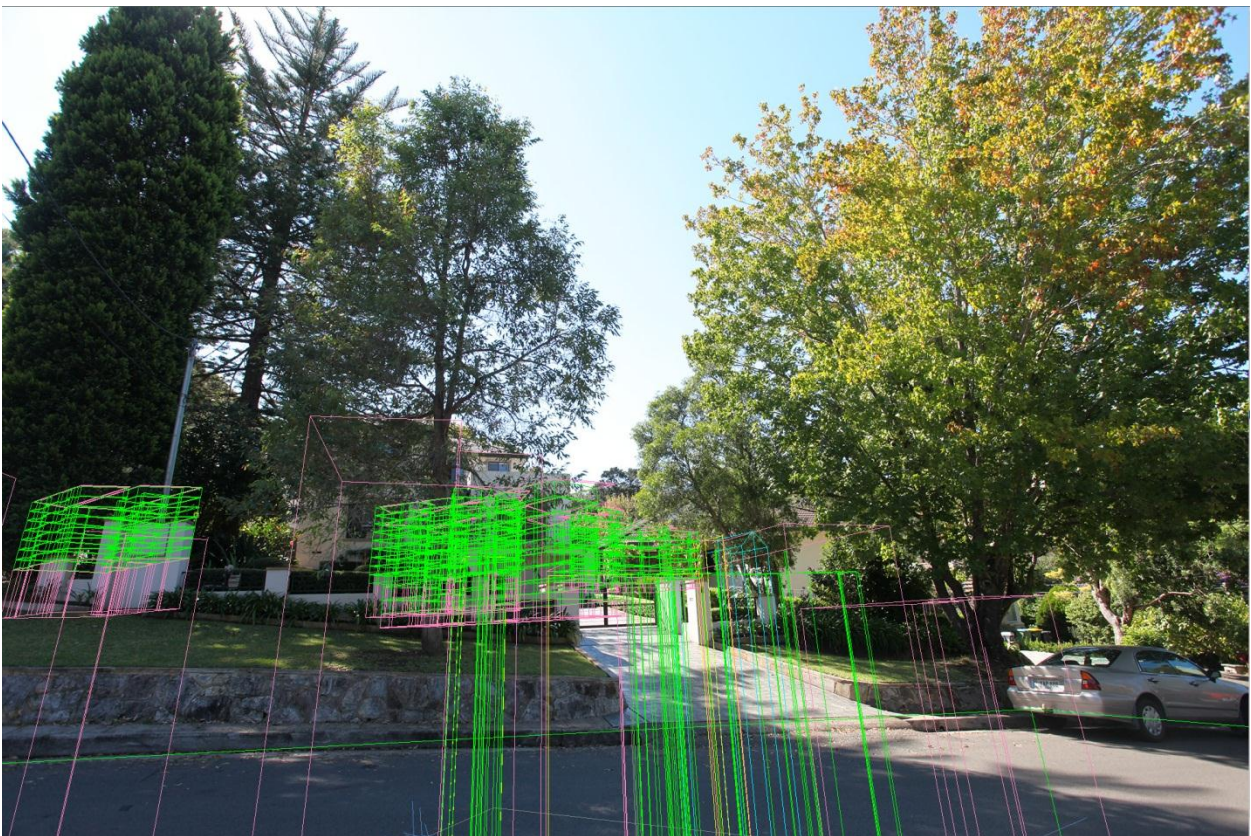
PHOTOMONTAGE ALONG ARILLA ROAD
